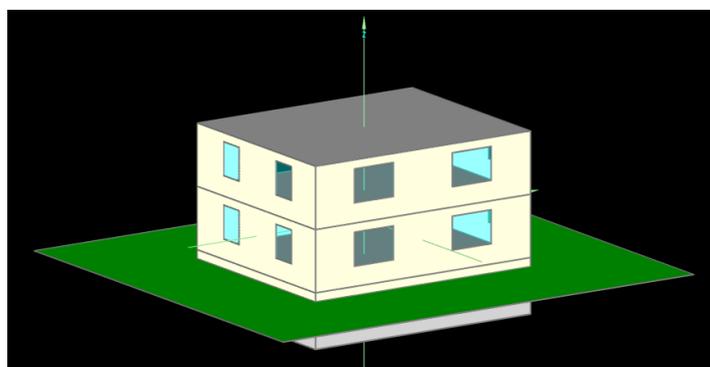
Exemplary residential building with two floors and basement with green roof, compared to a black or white roofing membrane.
